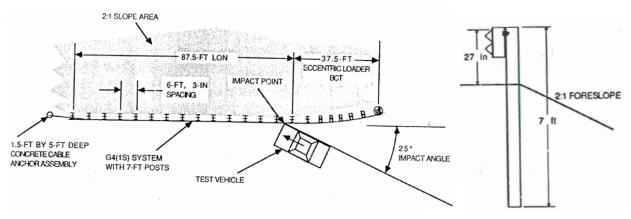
G4(1S) Installation Adjacent to 1V:2H Slope with 7-ft Long Steel Posts for Test Nos. 1717-1-88 through 1717-3-88 [8]
